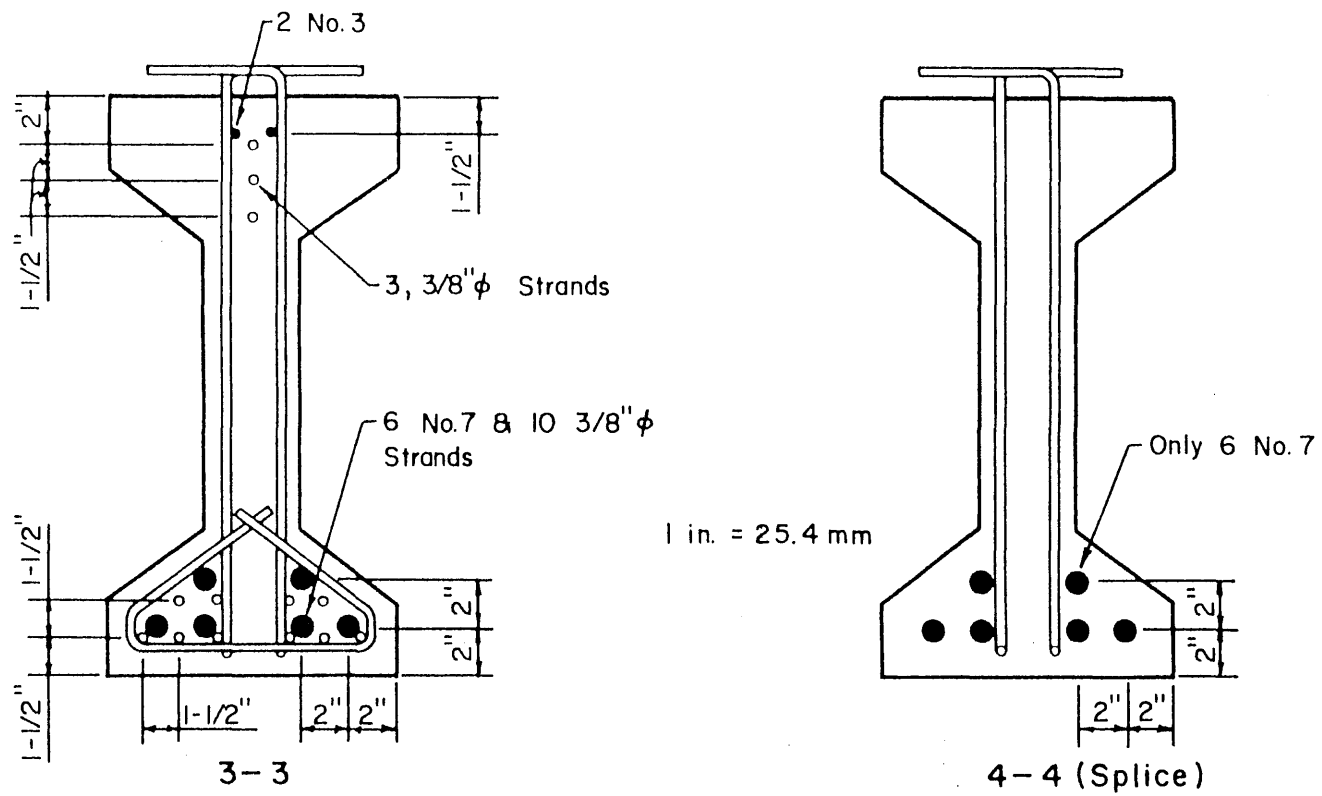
CROSS SECTIONS OF GIRDER AT EACH END OF SPLICE, MODEL 2
